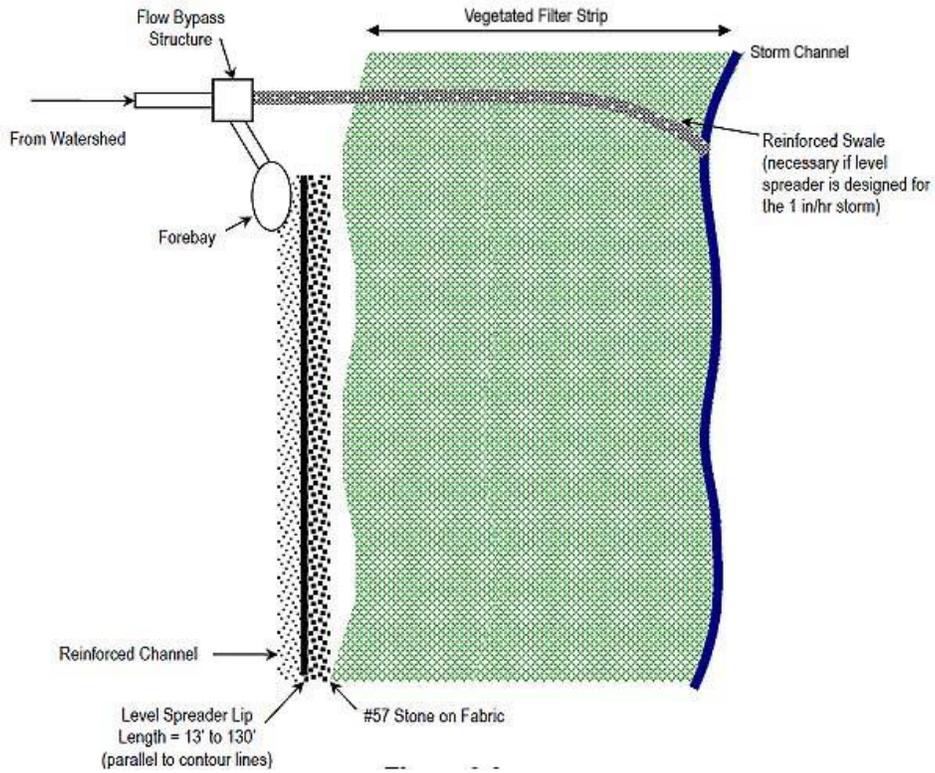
Plan and Cross Section of Engineered Level Spreader (ELS)
